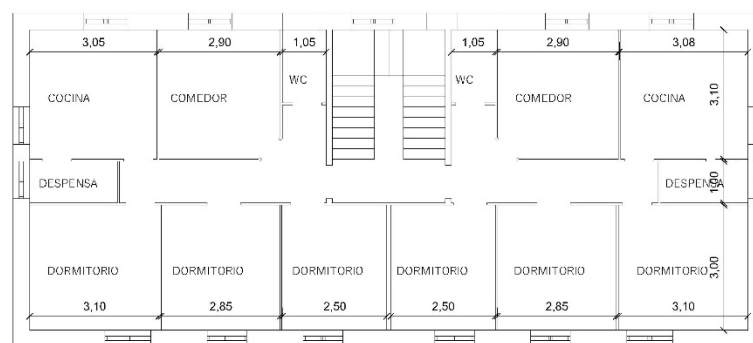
Floor plans of the Turuñana station passenger building. Source: Author
